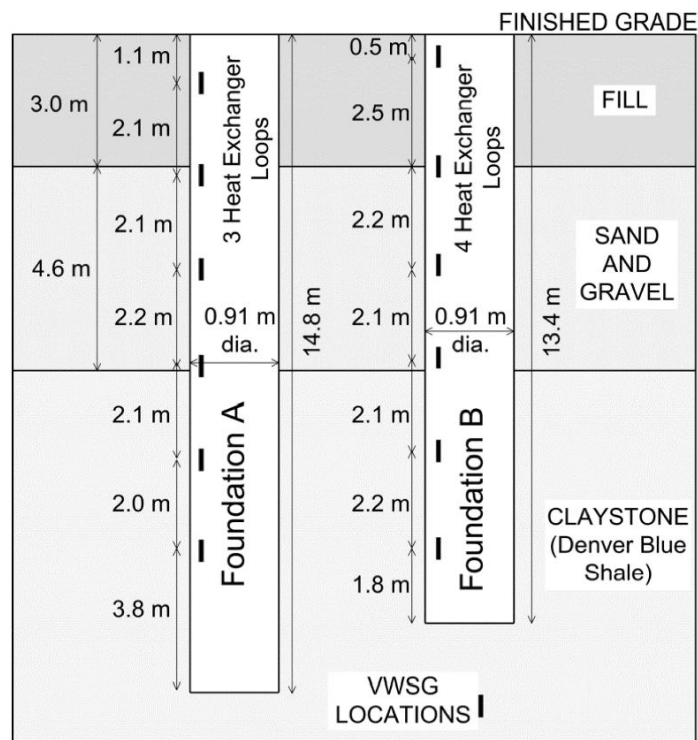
Soil stratigraphy and instrumentation layout at DHA
